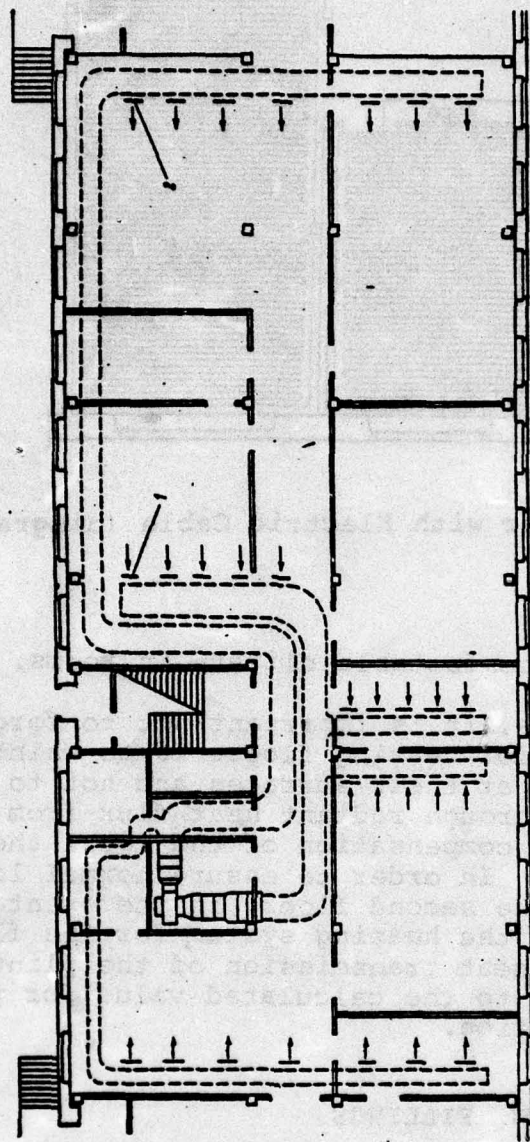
Heating a Floor with Air (Plan of Air Ducts)
